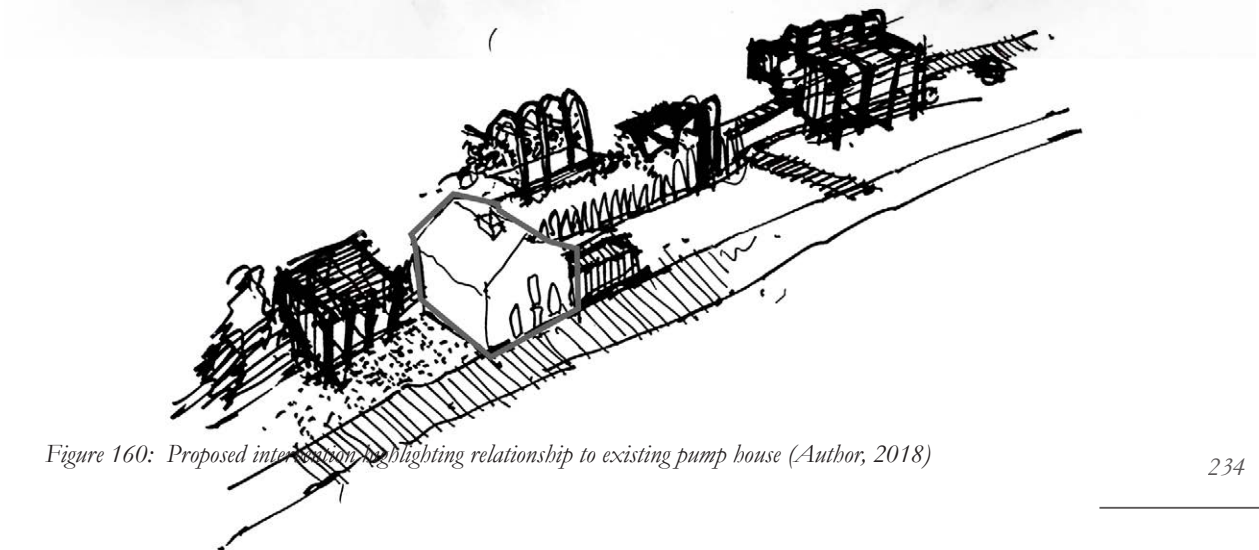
Proposed intervention, highlighting relationship to existing pump house (Author, 2018)
